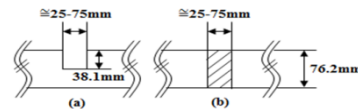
Dimensions of damage (a) Elevation (b) top All damages on the beam trial were located on the first quarter mark which was equal to 0.5m from origin.
